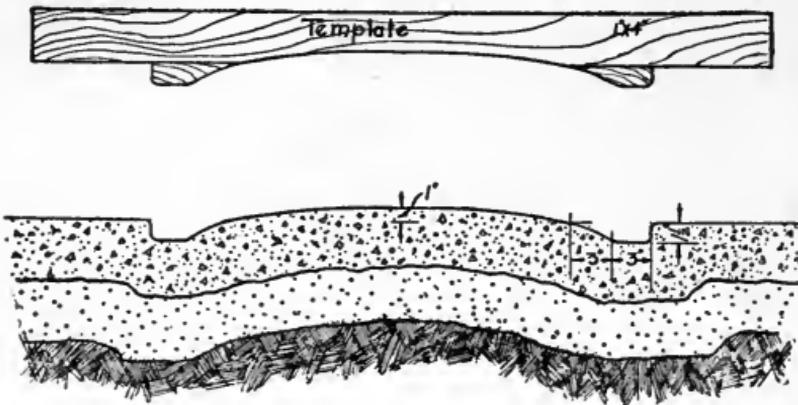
Concrete Center Alley for Hog House. The Upper Illustration Represents the Wooden Template Used to Form the Center of the Hog House Floor
